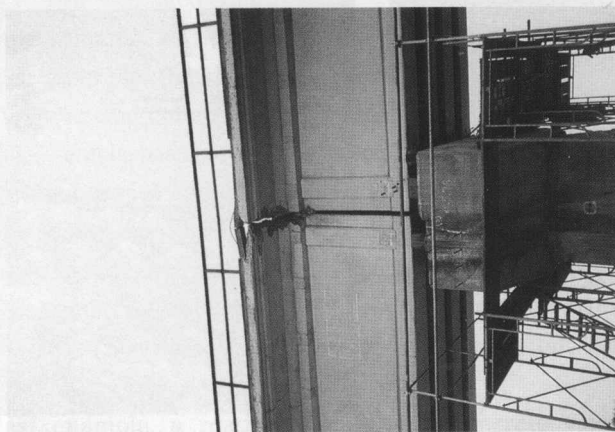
Crack at 50 cm above reinforcing steel
